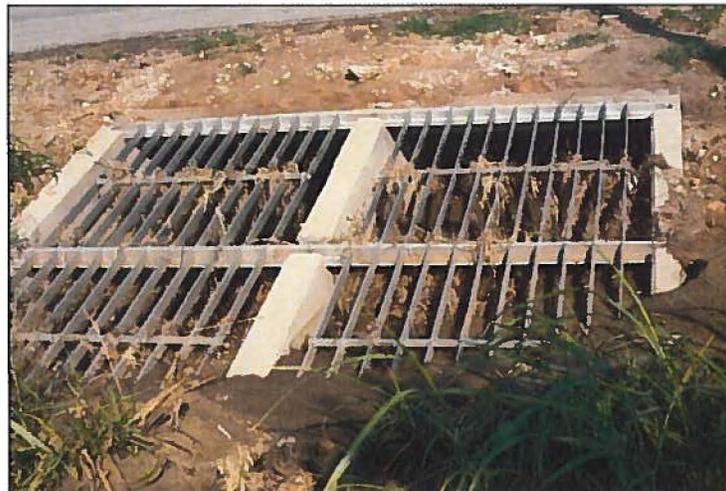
Steel grill debris rack on slope mitered culvert entrance.
